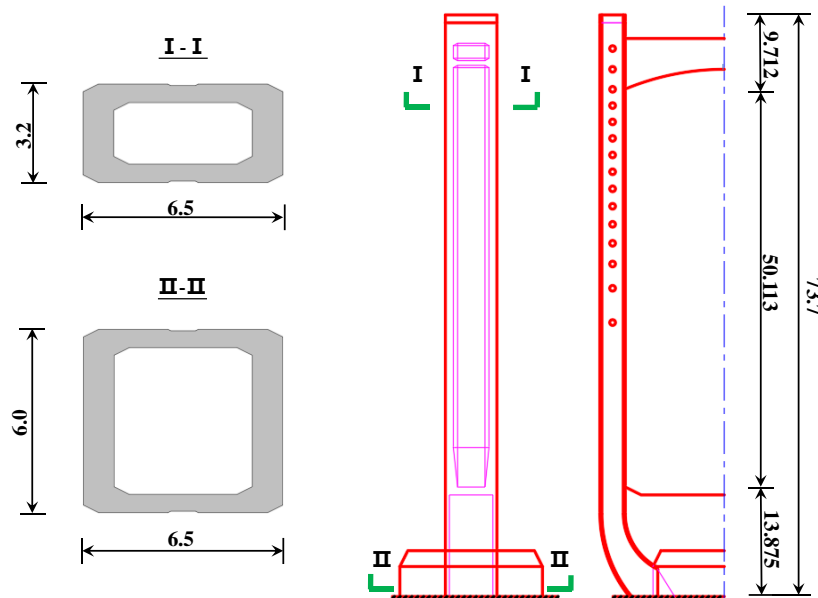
Structure diagram of main tower of rotary cable-stayed bridge (m)
